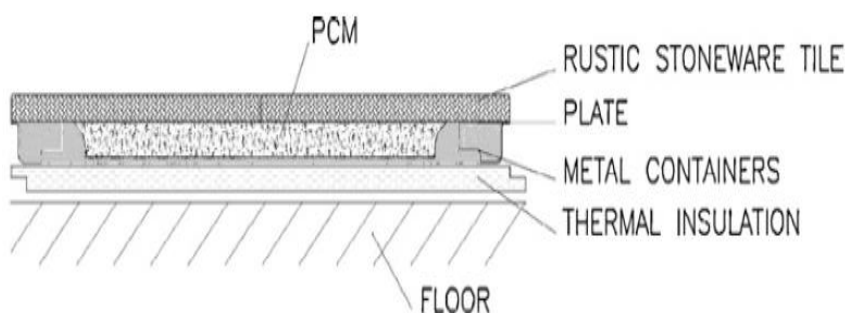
schematic of the floor with PCM integrated in tiles [103]
